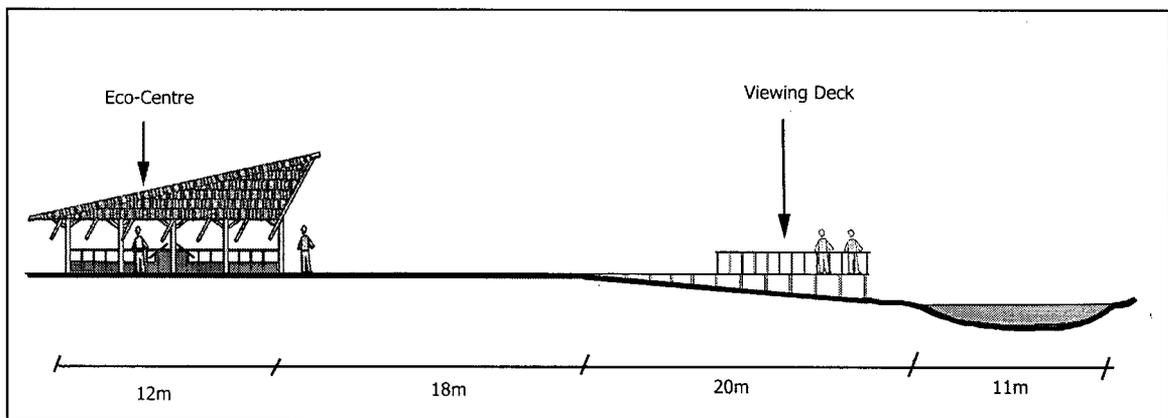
10 Eco Centre and Viewing Deck East Elevation. Scale 1:400
